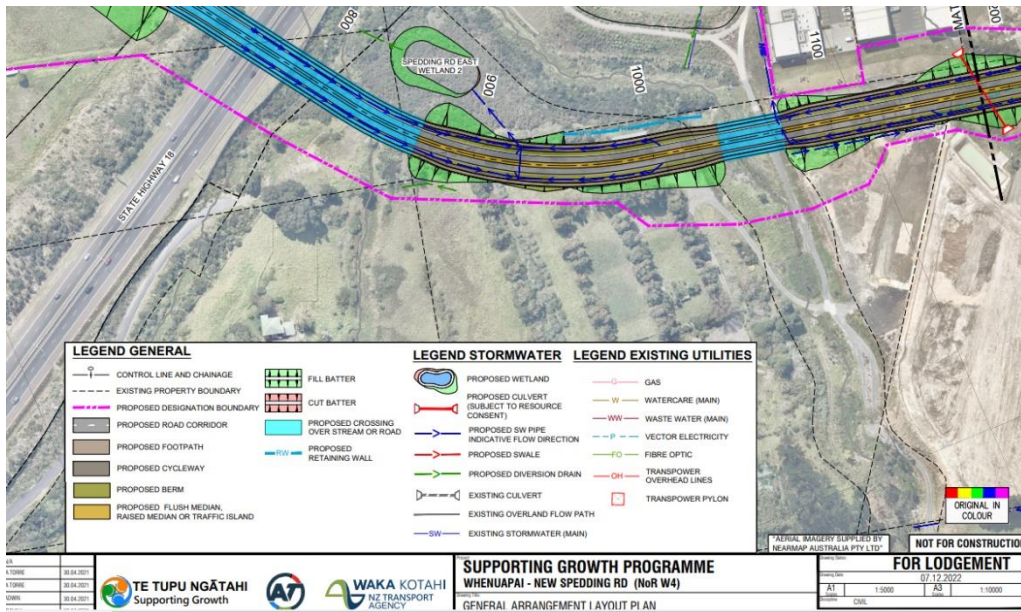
The general arrangement plans of the designation, showing the proposed road corridor layout
